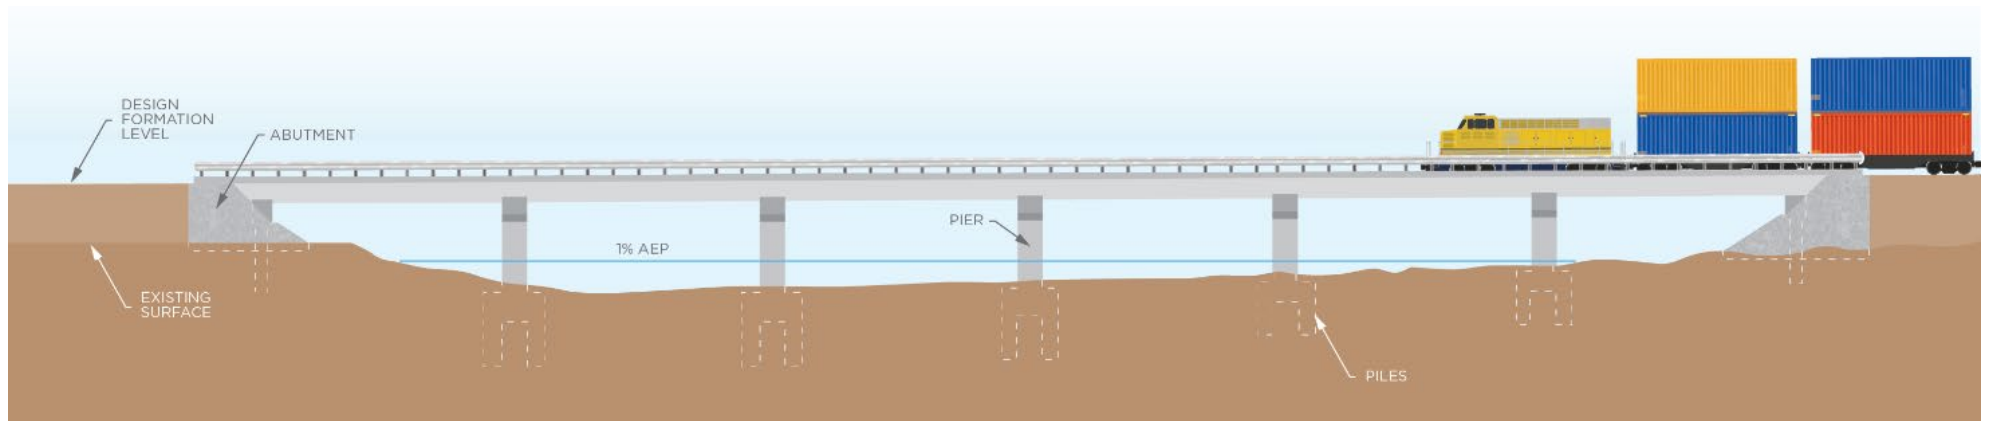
TYPICAL SECTION OF RAIL-OVER-WATERCOURSE BRIDGE STRUCTURE
